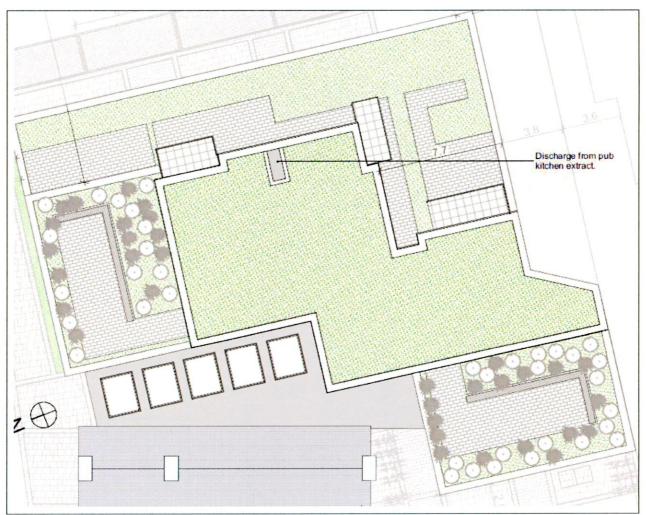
Showing the proposed rooftop layout showing the proposed kitchen discharge location.
